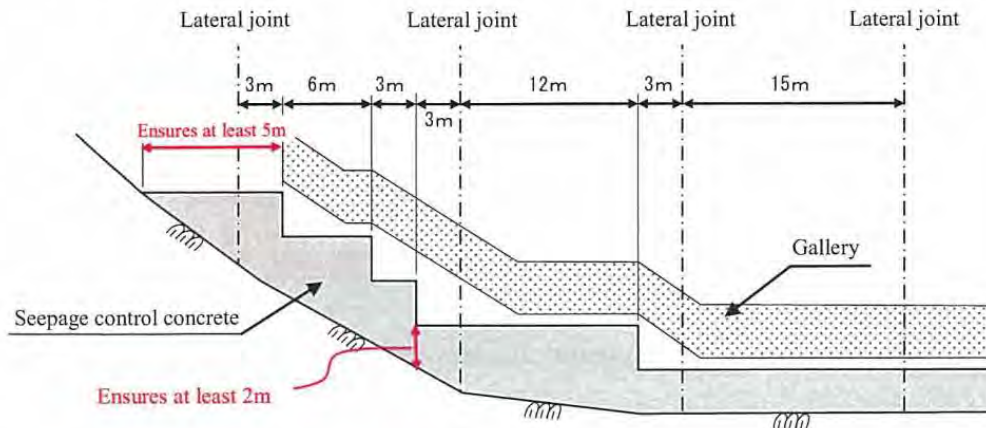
Layout of Seepage Control Concrete (Dam Axis Direction Section)
